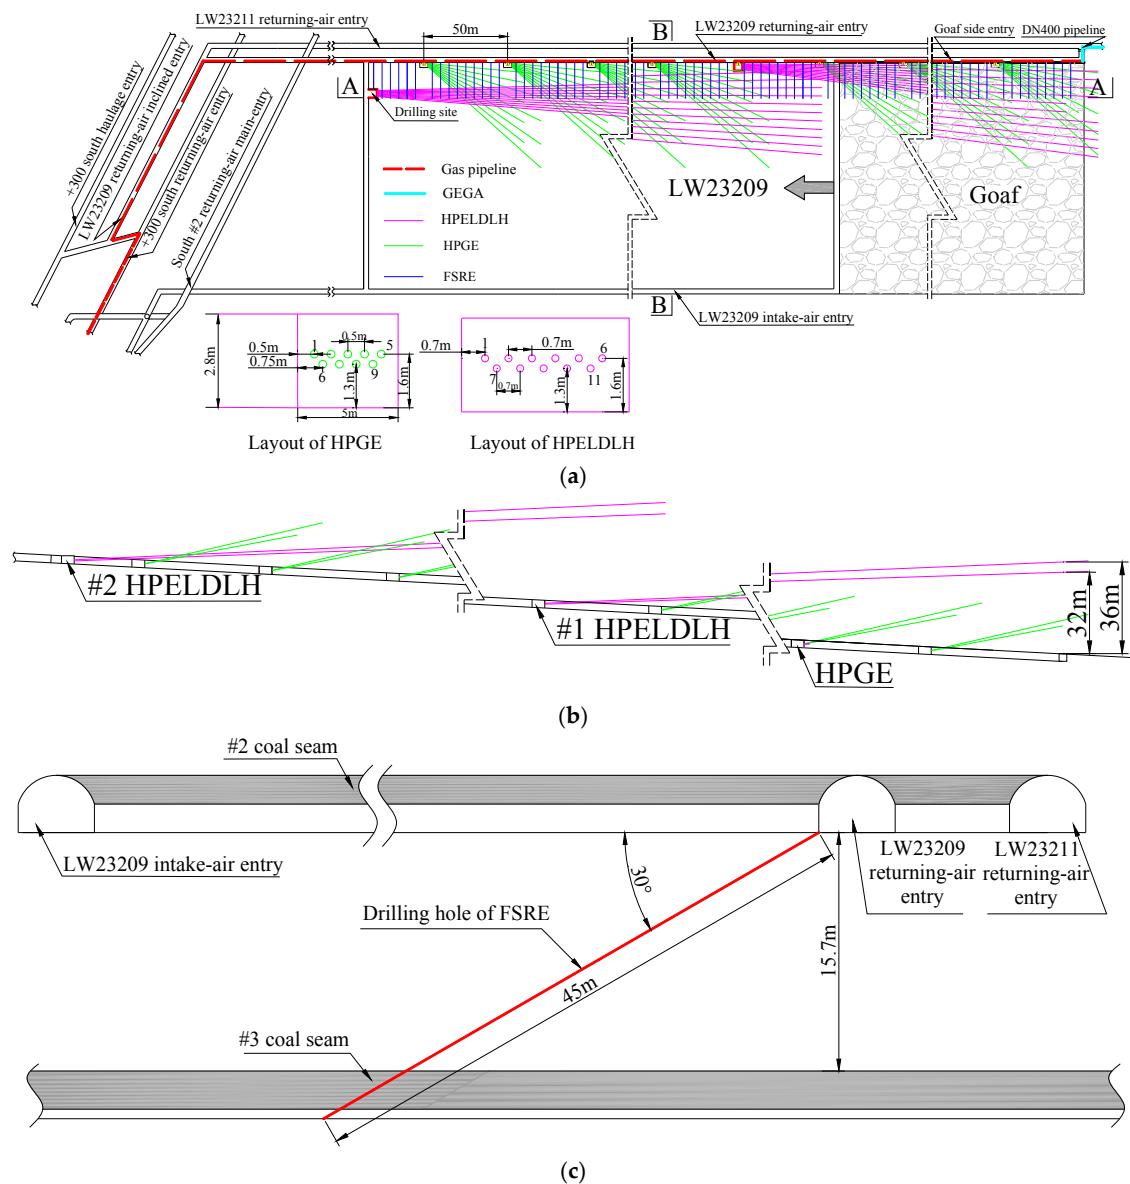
Gas drainage pipelines and borehole layout: (a) Pipelines and borehole layout; (b) Section A-A; (c) Section B-B.
